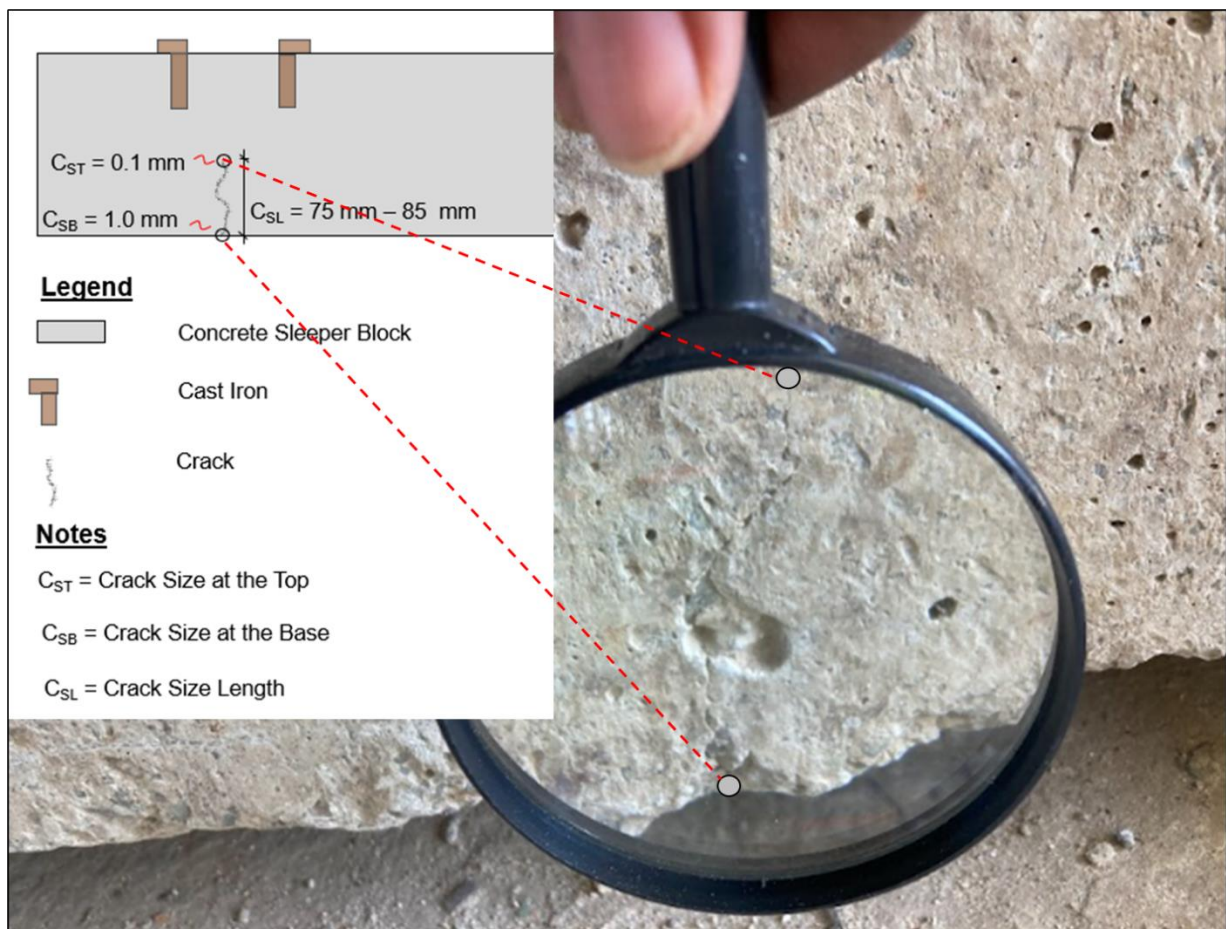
A typical concrete crack exploded using a magnifying glass
